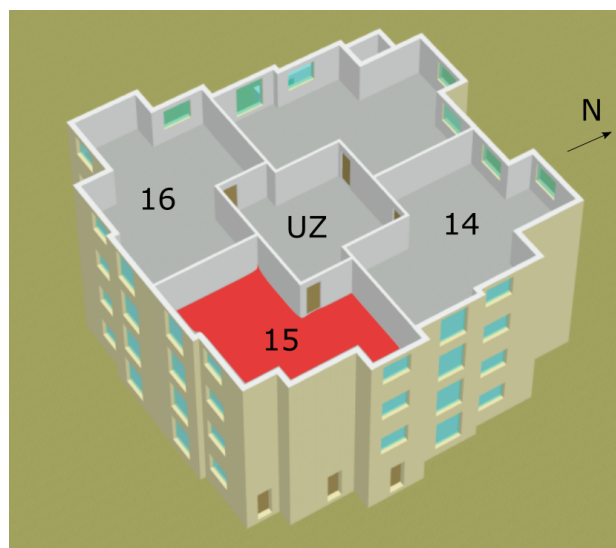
Internal view of the building model top floor in Pleiades Modeller with floor of apartment n° 15 in red.
